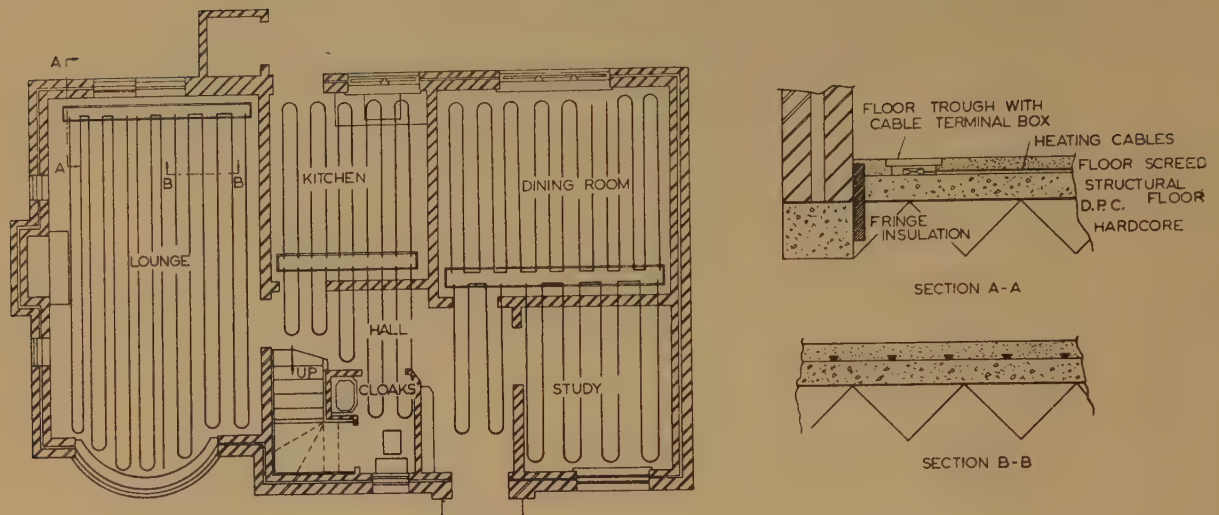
Electrical floor-warming layout for a private dwelling house.
